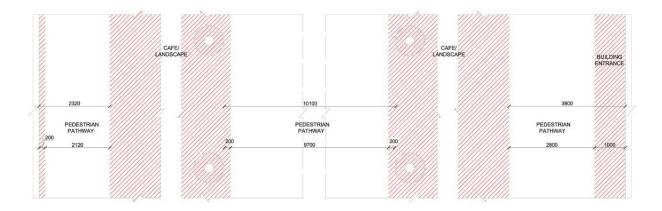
Street width and buffer spaces (in mm) for Gateway 11 in the area surrounding Hauptwache in Frankfurt am Main
